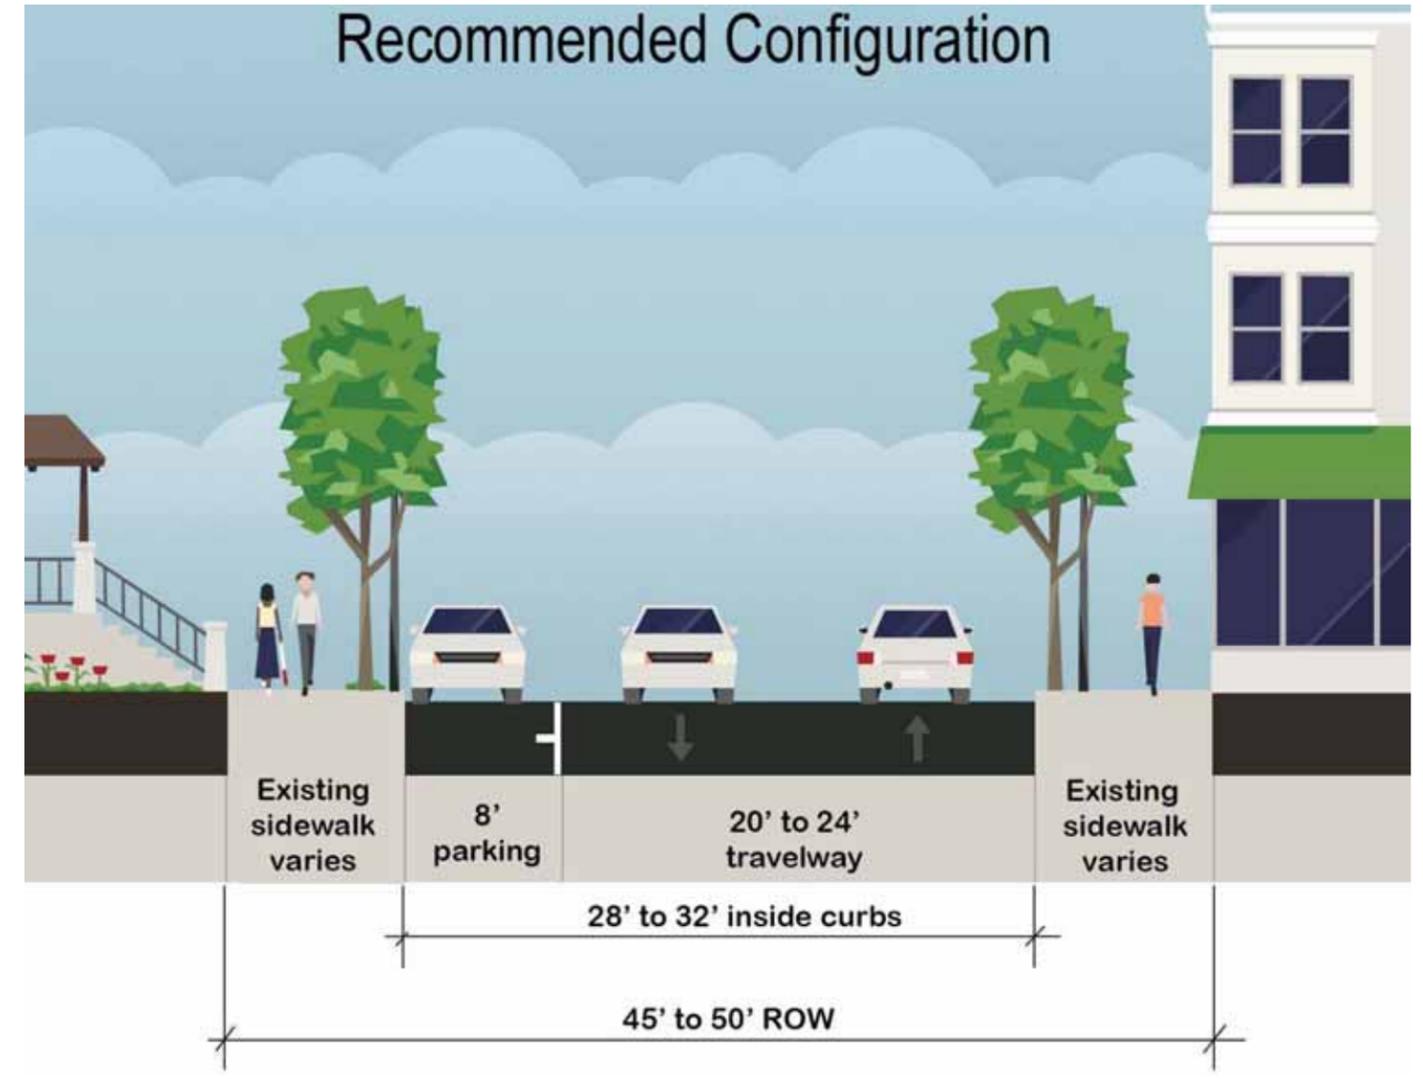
Oxford Street Two-way Concept: Elm Street to Alder Street
